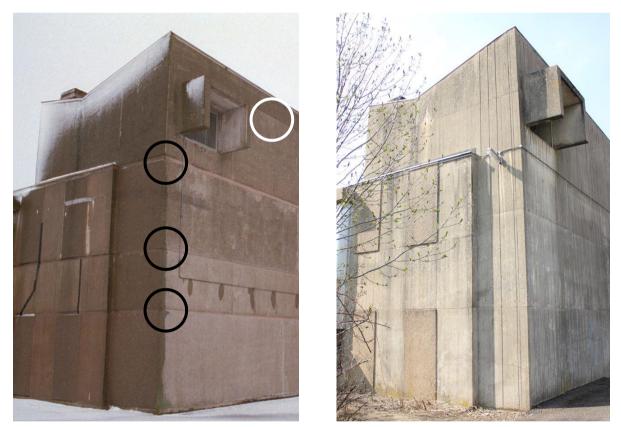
Elevational comparison of Kirknewton and Cambridge concrete detailing
